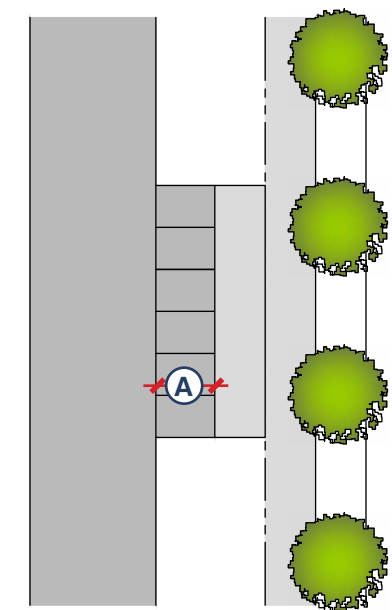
RESIDENTIAL GROUND FLOOR PATIO PLAN VIEW DIAGRAM
